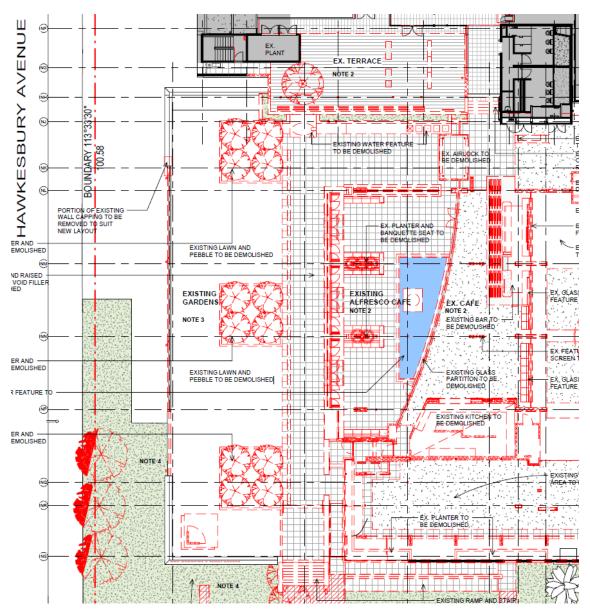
Level 2 existing and demolition plan (Source: Altis)
